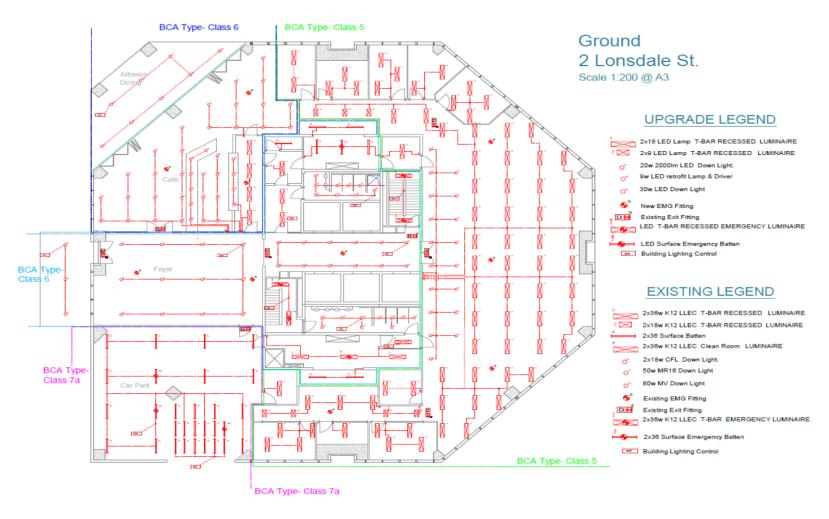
Professionally drafted reflective ceiling plan example – guide only
